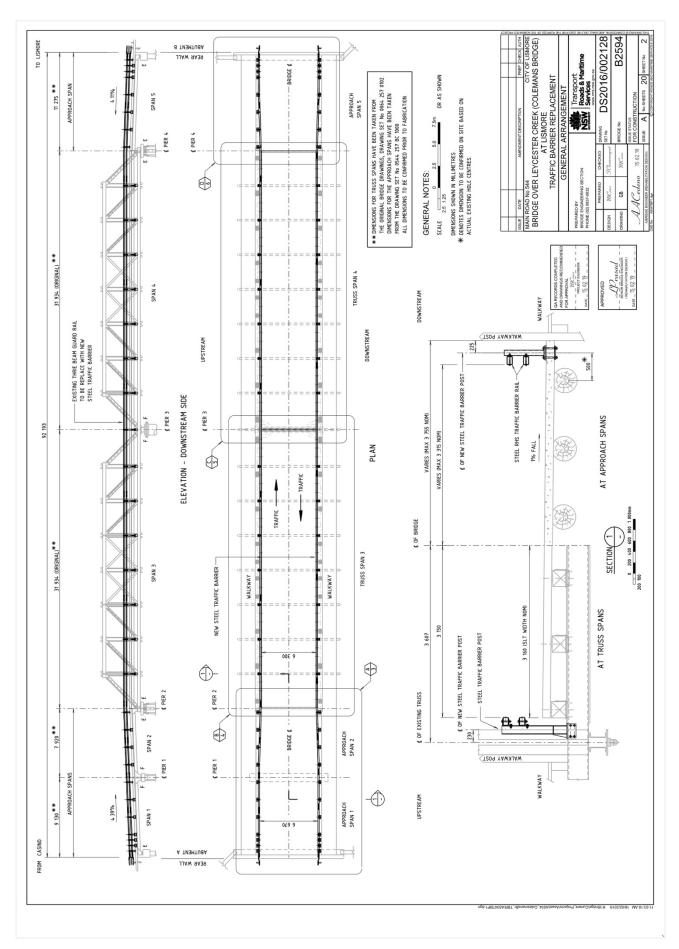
PROPOSED TRAFFIC BARRIER REPLACEMENT – GENERAL ARRANGEMENT
